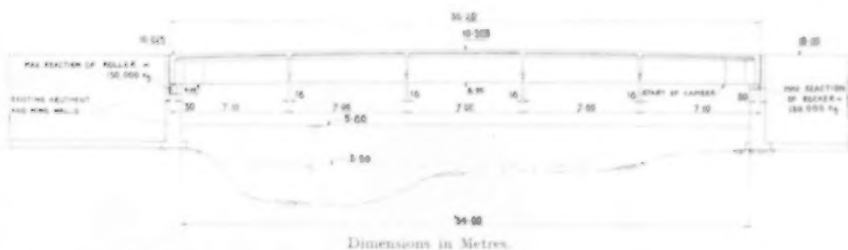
Spacing of Transverse Diaphragms for a Road Bridge in Colombia.
